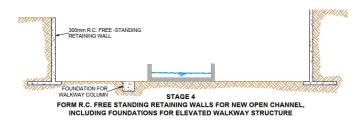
Extract from Camac Culvert Reopening Works drawings
